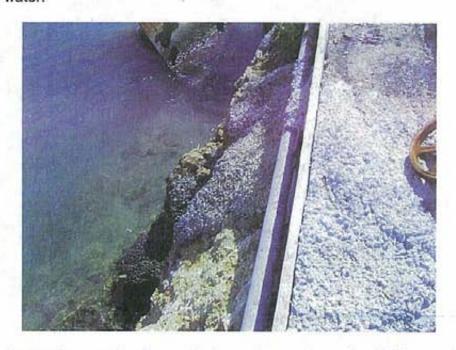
An ongoing construction project was observed on-site. Evidence of concrete spillage into the receiving water was observed on-site.
